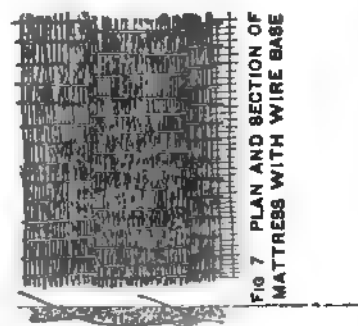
PLAN AND SECTION OF MATTRESS WITH WIRE BASE
